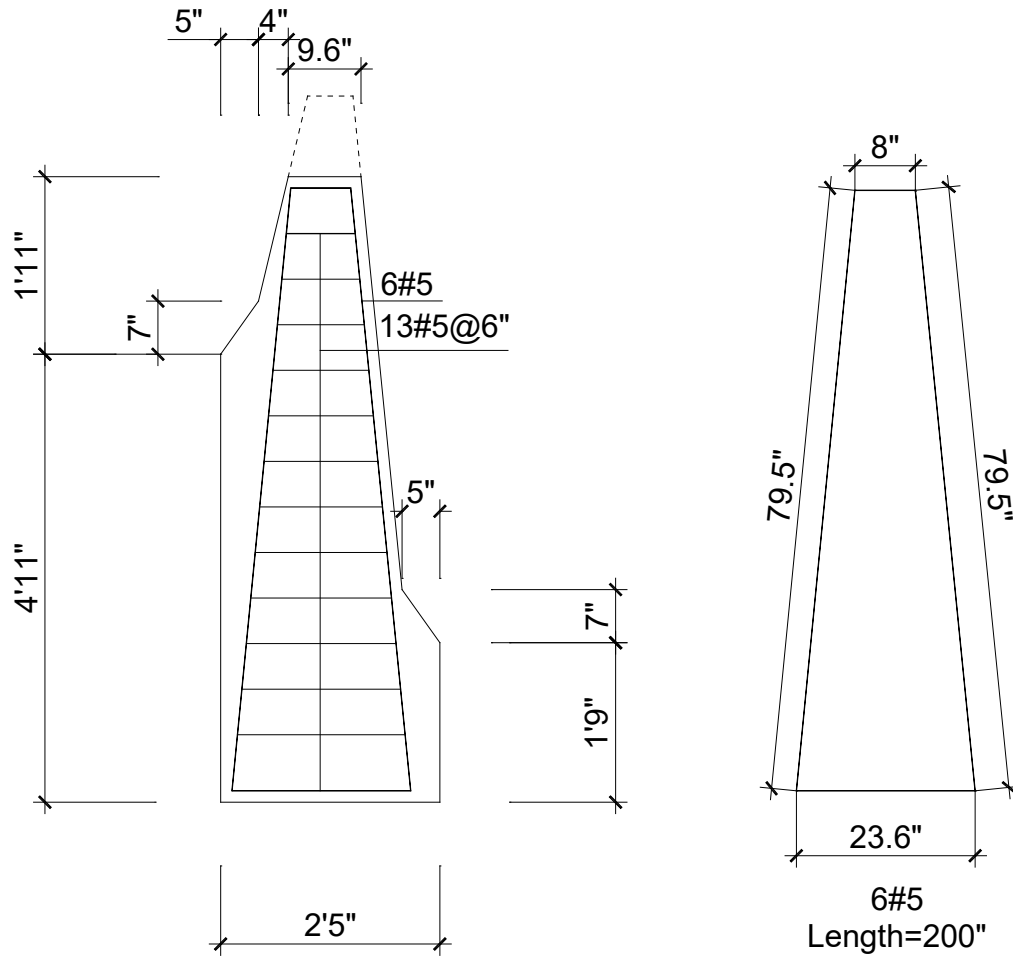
Detail of concrete wall of T7B-GRS wall for testing in T-Cage
